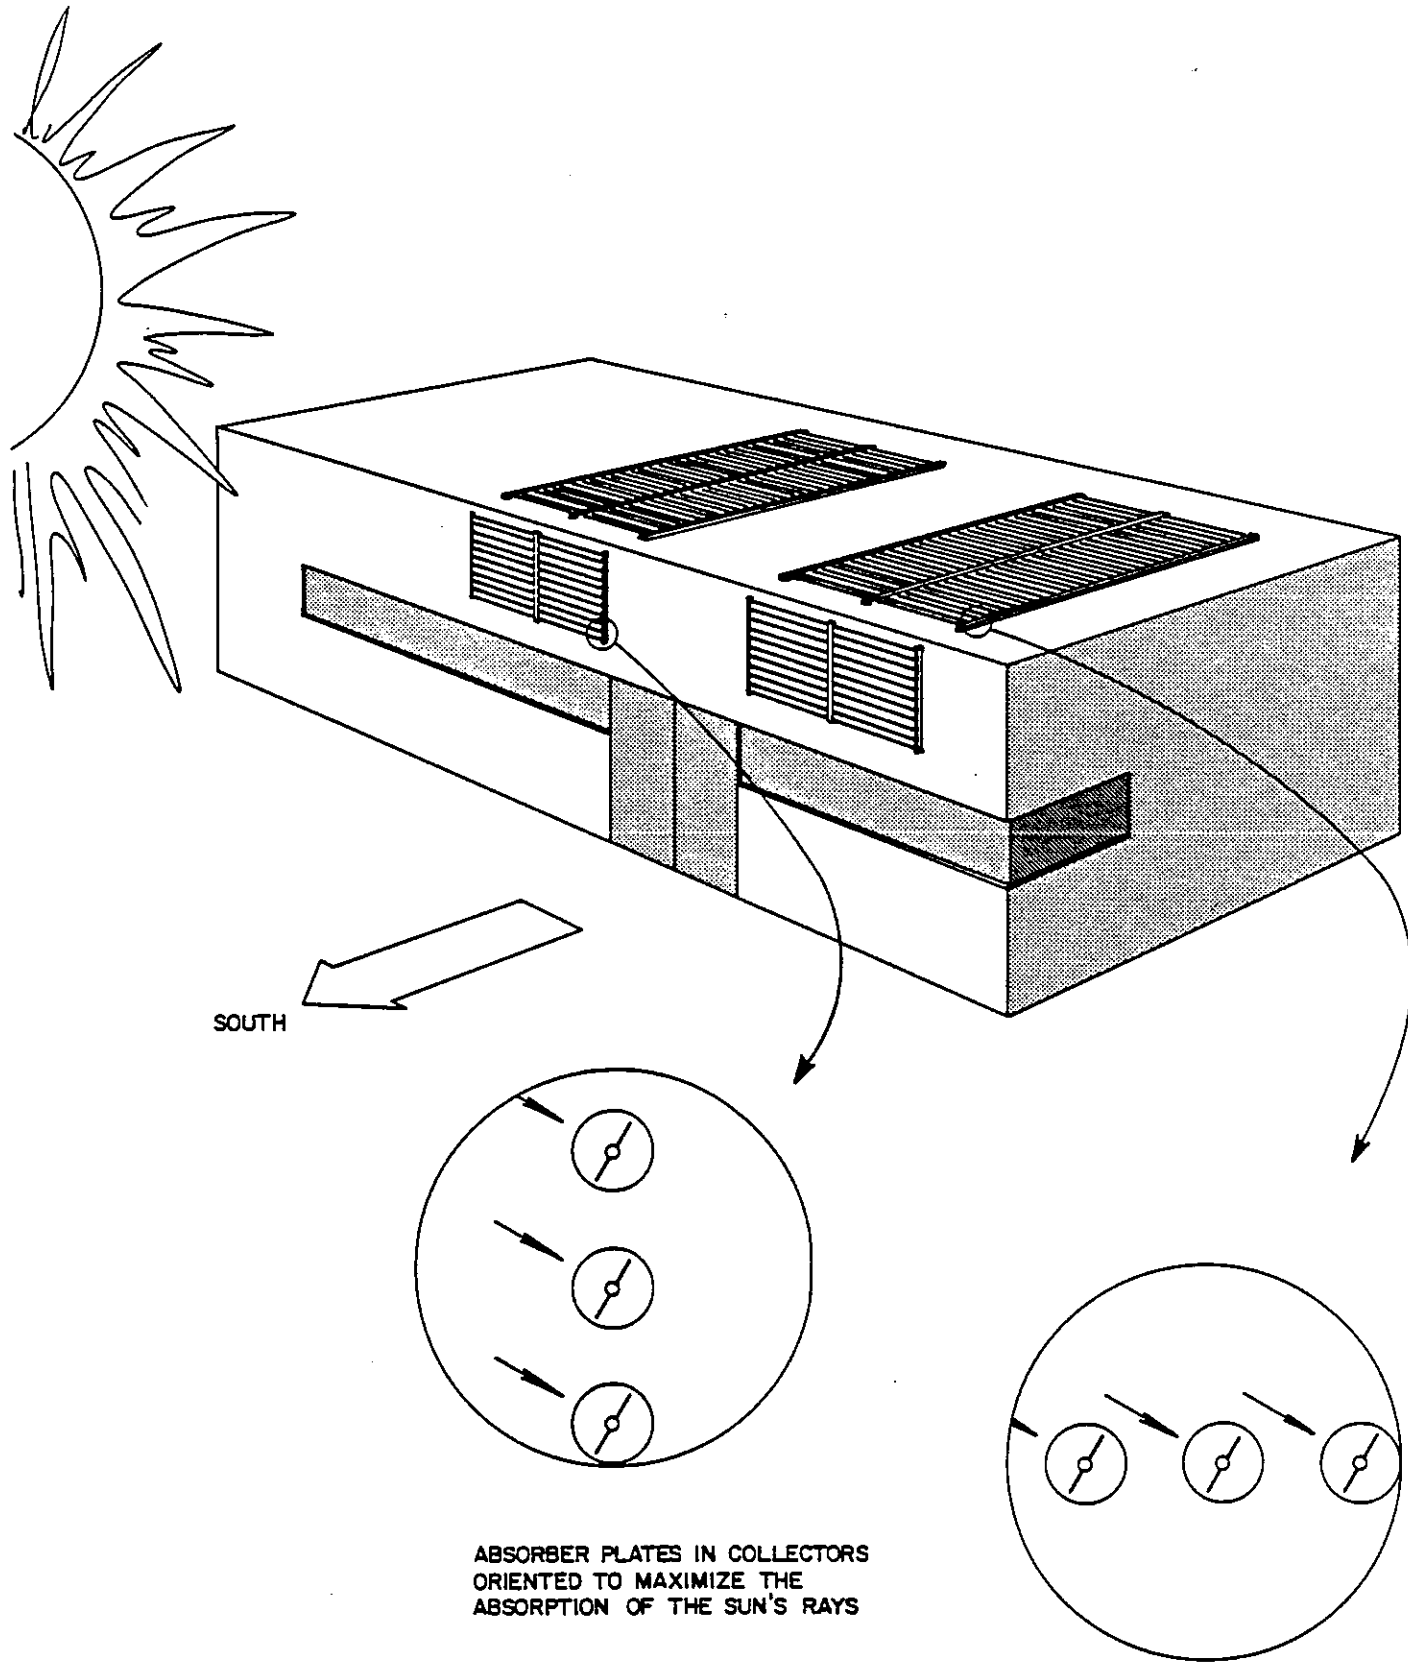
WALL AND FLAT-MOUNTED COLLECTOR MODULES
